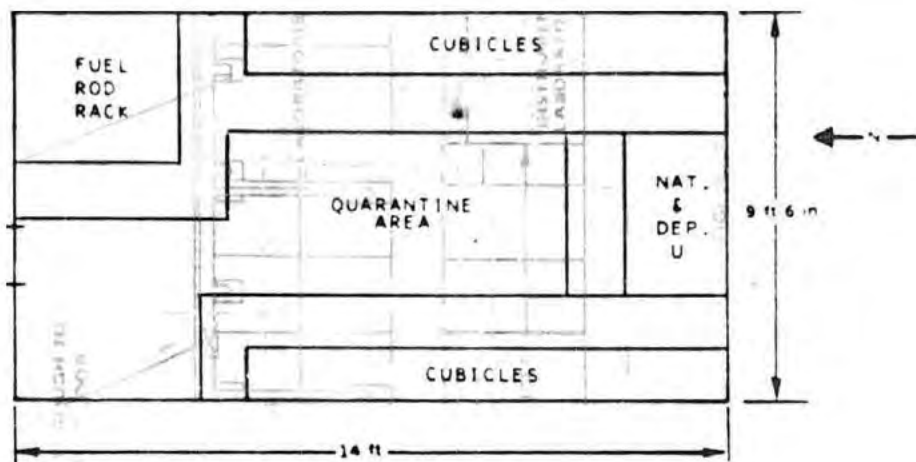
BUILDING 103 VAULT LAYOUT
